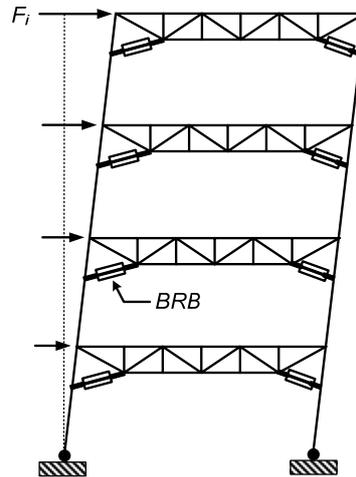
Buckling-Restrained Knee Braced Truss Moment Frame system.
